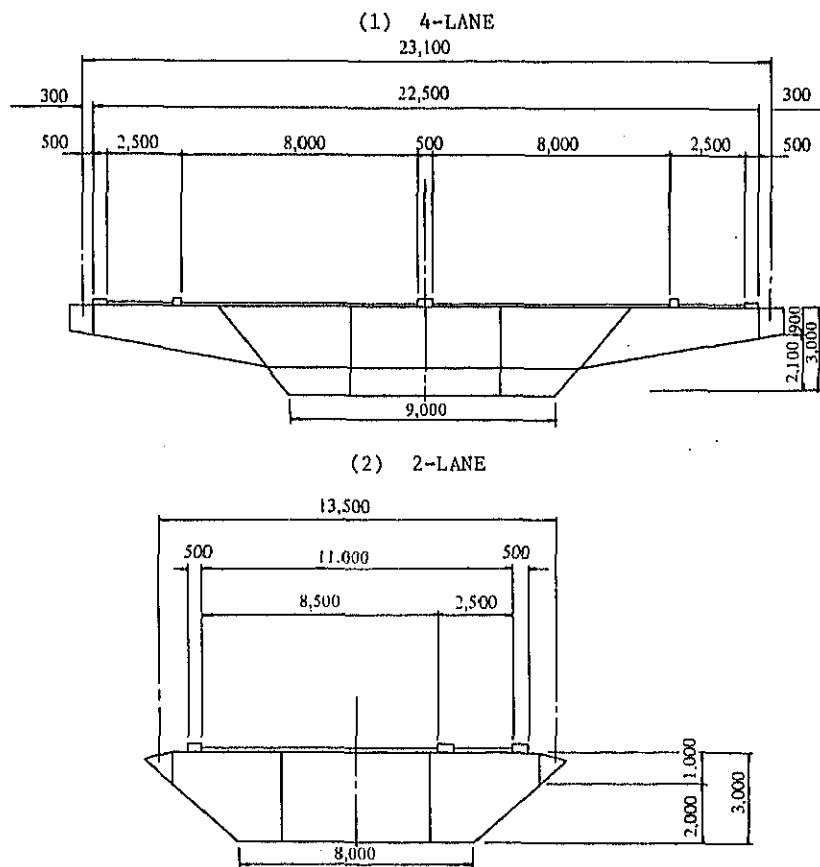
CROSS SECTION OF STEEL GIRDER
